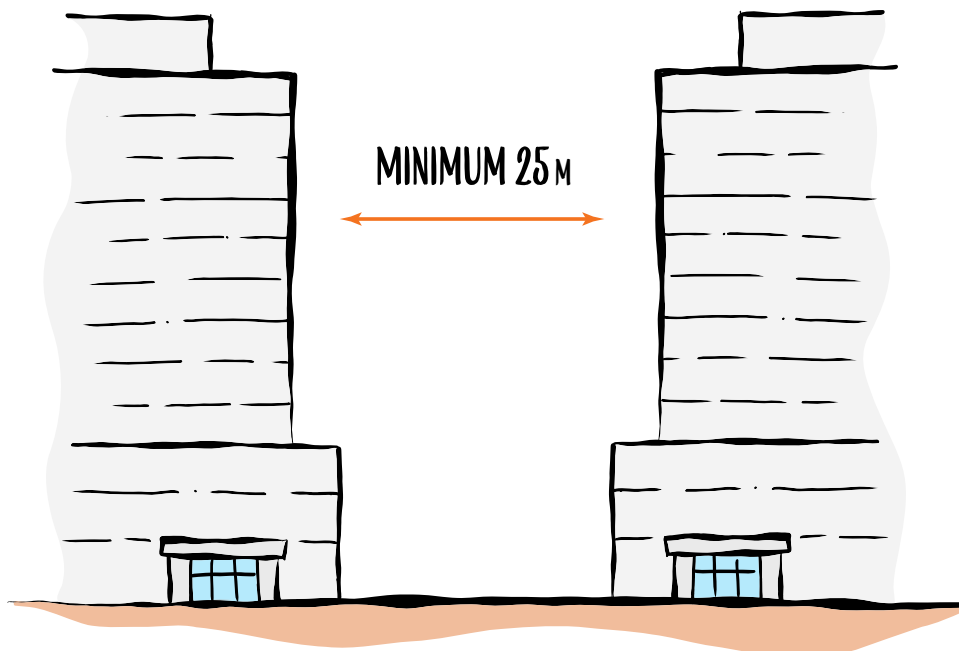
Space towers on the same site or block to have a minimum tower separation of 25 m measured balcony to balcony, with 30 m preferred to maintain open space and mountain views between buildings.
